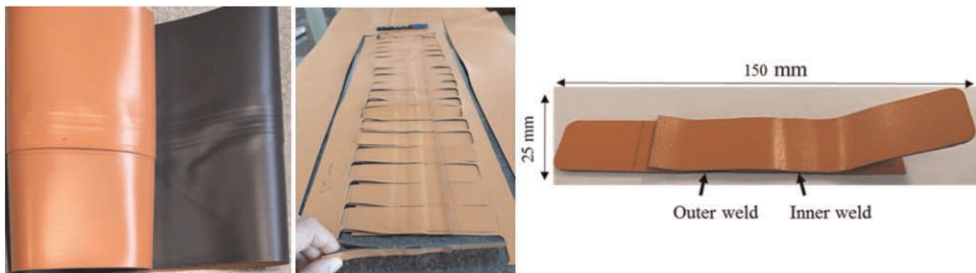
Dual-track geomembrane seam sample and seam specimen.
